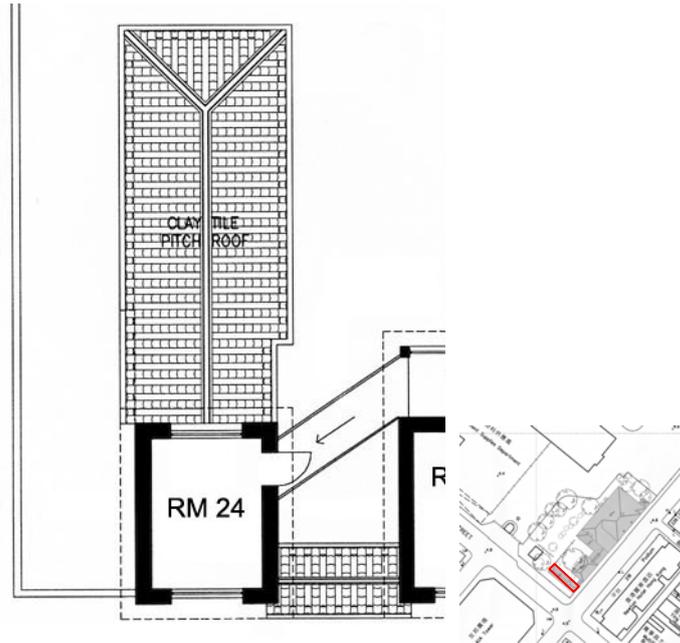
Existing first floor plan of Annex B at No. 12 Oil Street, North Point (1:200).
